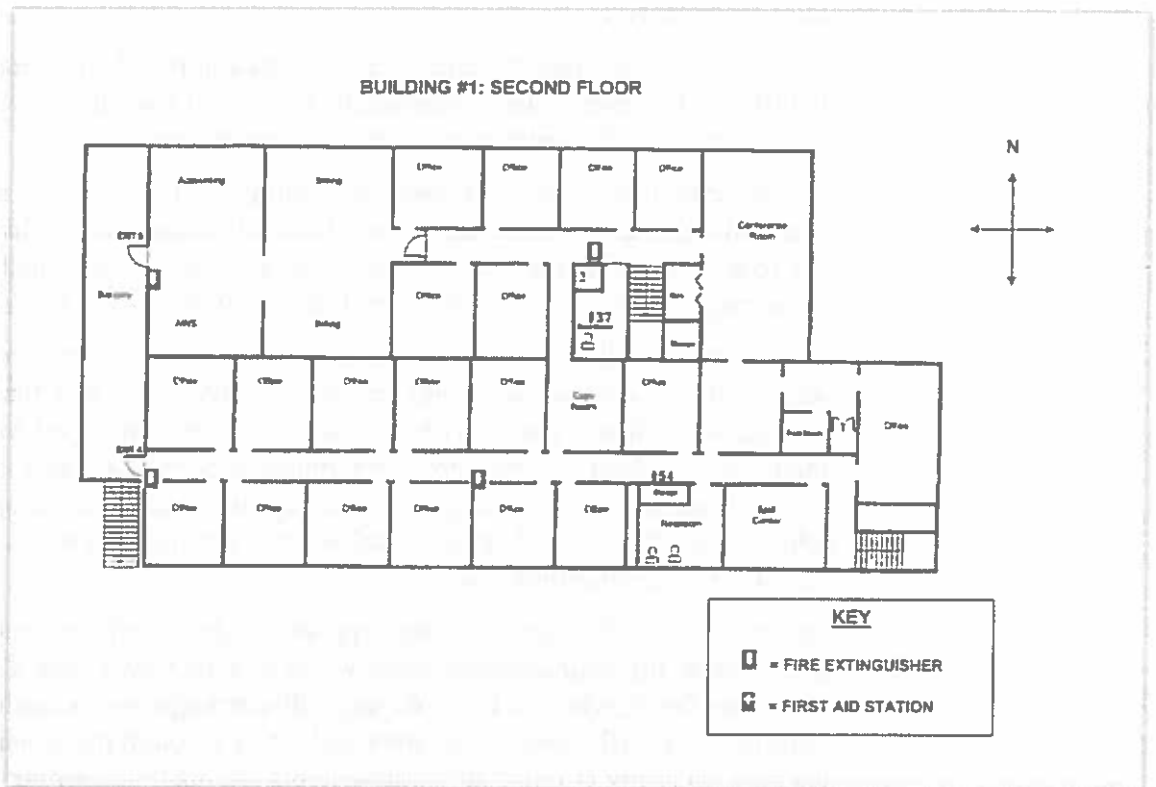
EMI Transfer Station Facility Buildings and Structures.
